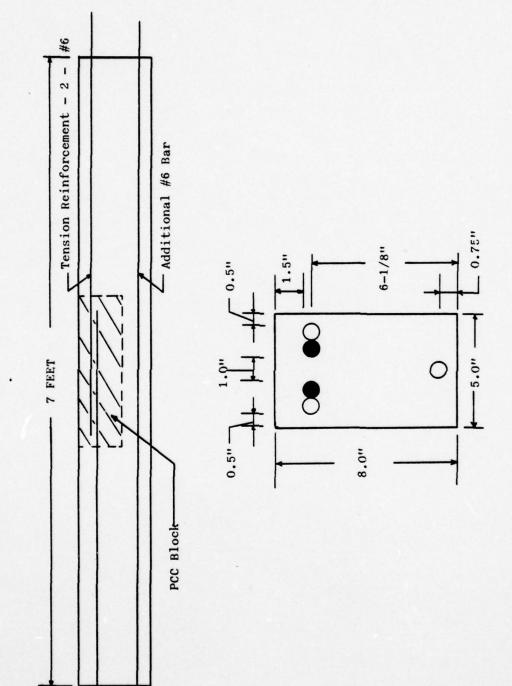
Beam dimensions and geometrical constants and reinforcement location.
